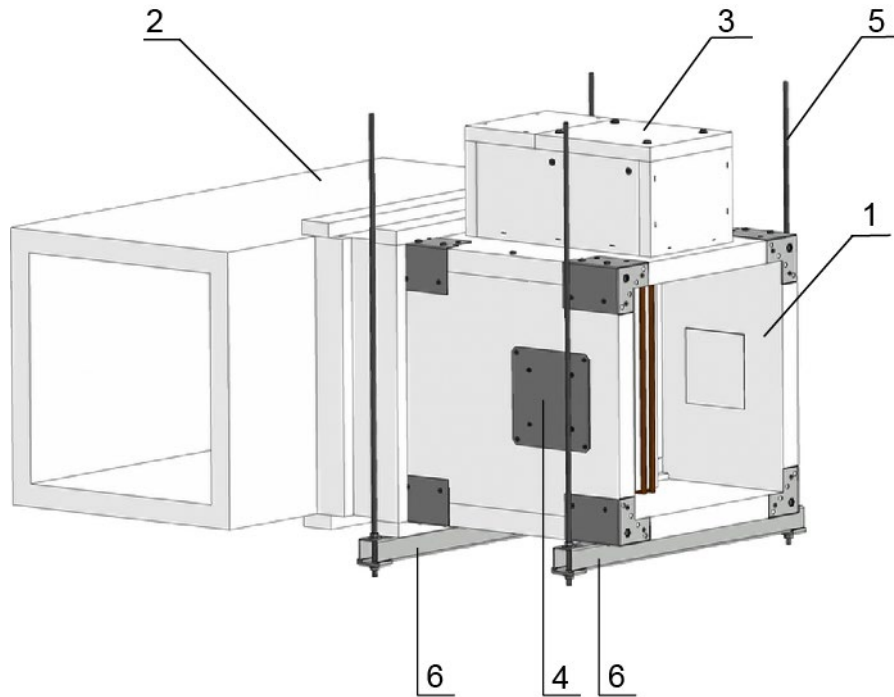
Installation to the side of horizontal duct with blade and spindle in vertical position.
